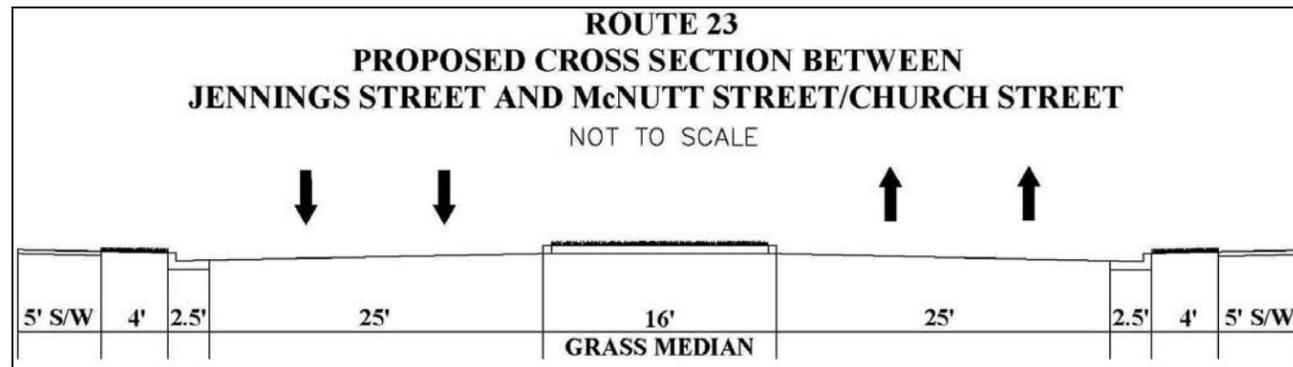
Proposed Cross Section Between Jennings Street and McNutt Street/Church Street
